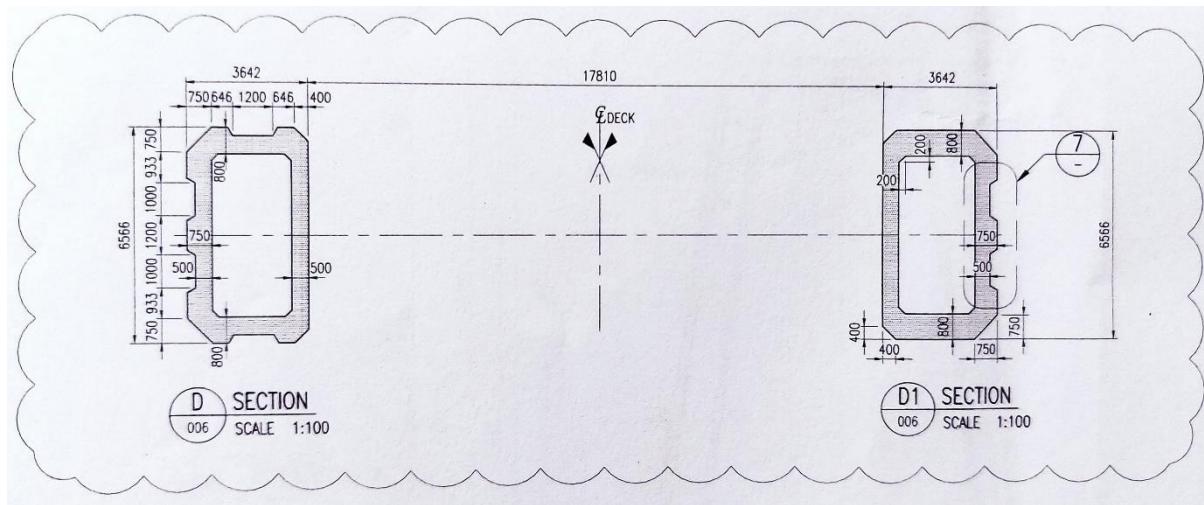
CROSS SECTION OF PYLON P4R TO BE CONCRETED
